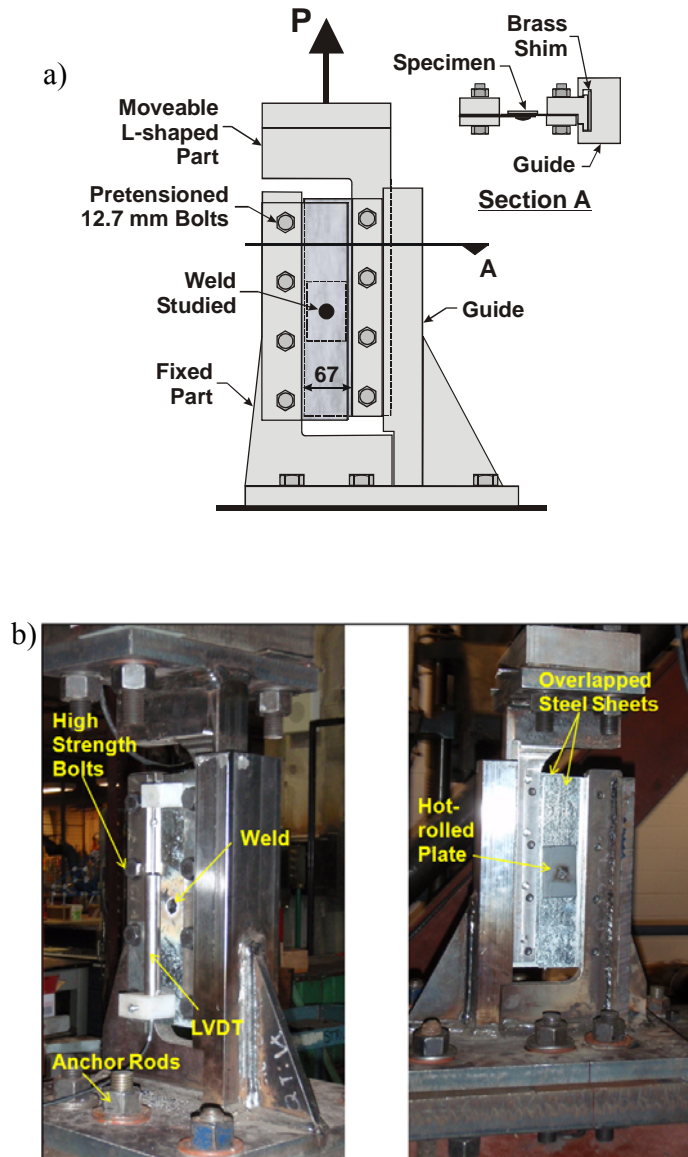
Shear test set-up: a) Schematic elevation view; b) Photos
